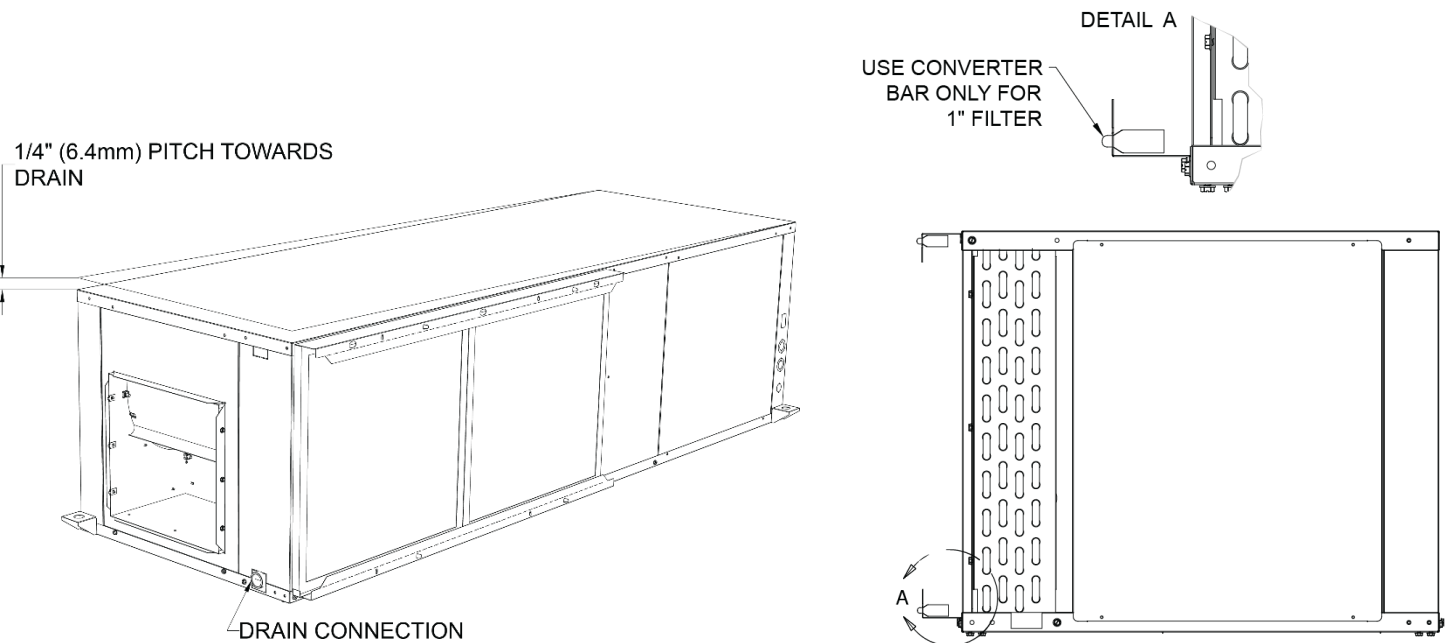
Horizontal Unit Pitch & Filter Rail Detail
